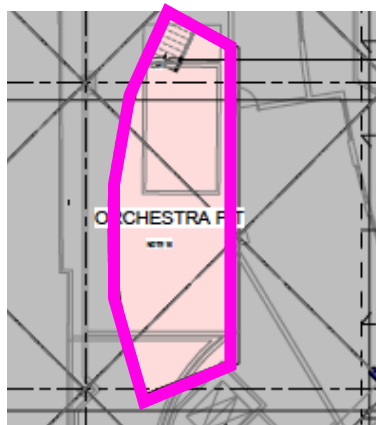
New & Existing Construction – Building Envelope – Insulation Mark Up – Level 3
